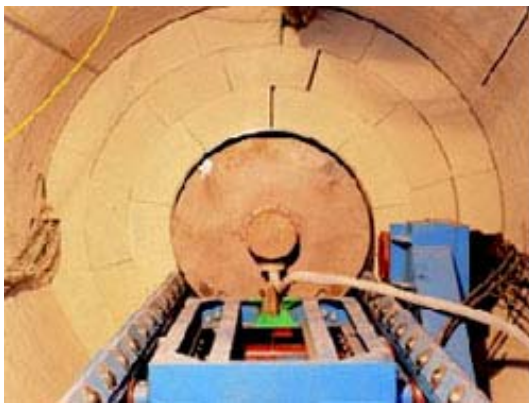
Examples of EBS component manufacture, testing and installation.
